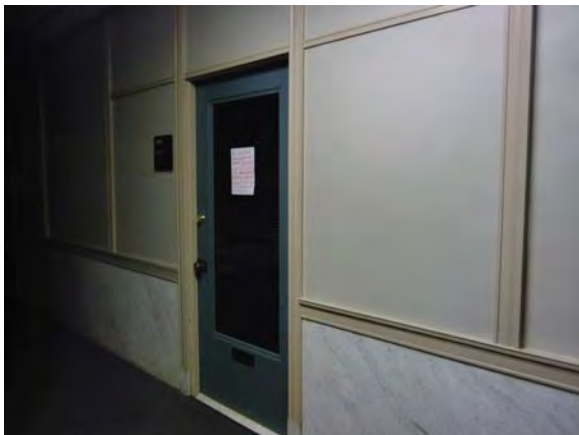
Covered storefront wall, main corridor, typical of floors 2 through 21.
